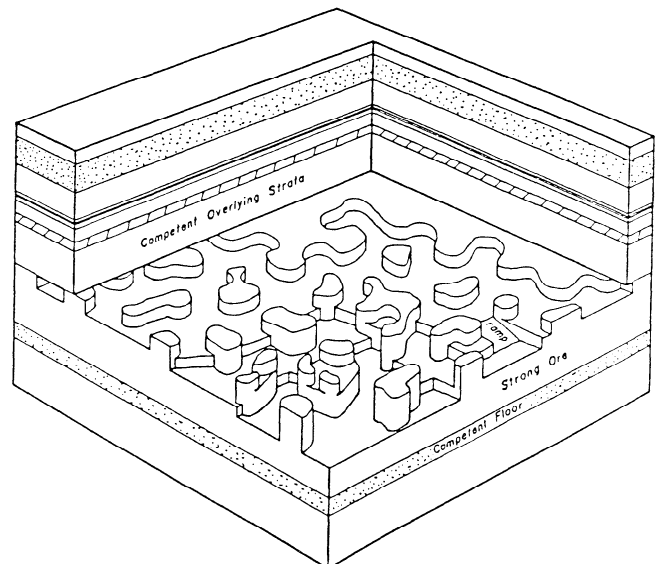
Stope and pillar mining with random pillars (Clark and Caudle, 1961).
